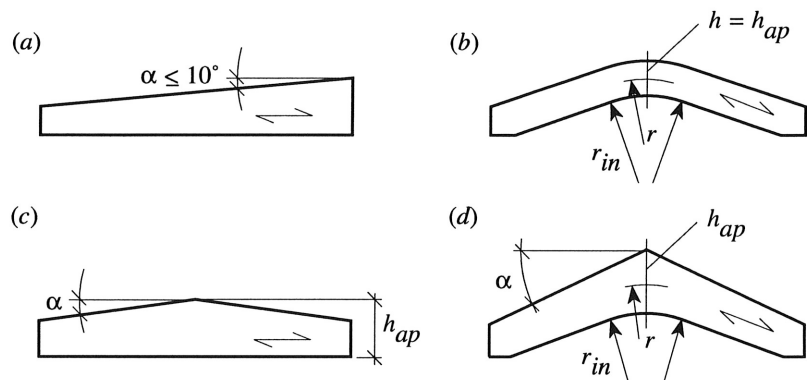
(a) Single tapered beam, (b) curved beam with constant cross-section, (c) double tapered beam, (d) pitched cambered beam.
